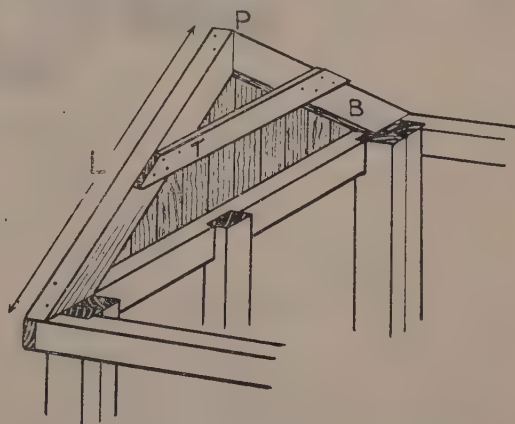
HOW TO MAKE AND FIT END TRUSSES.
